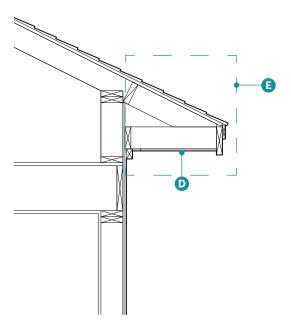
Section Detail of Highest Eave for Pitched Roof
